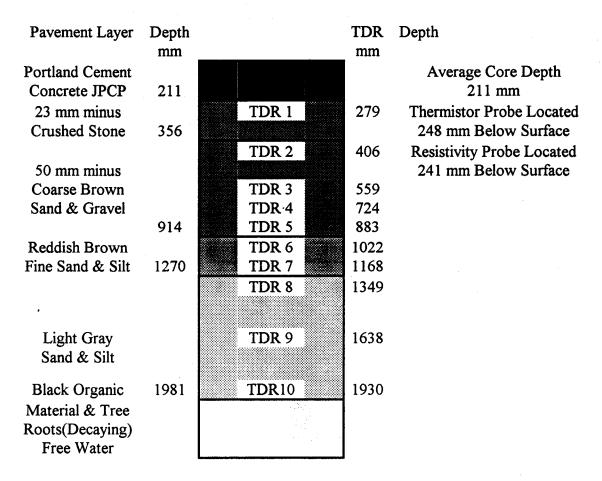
Profile of Pavement Structure and Probe Depths from Surface, Station 0-10
